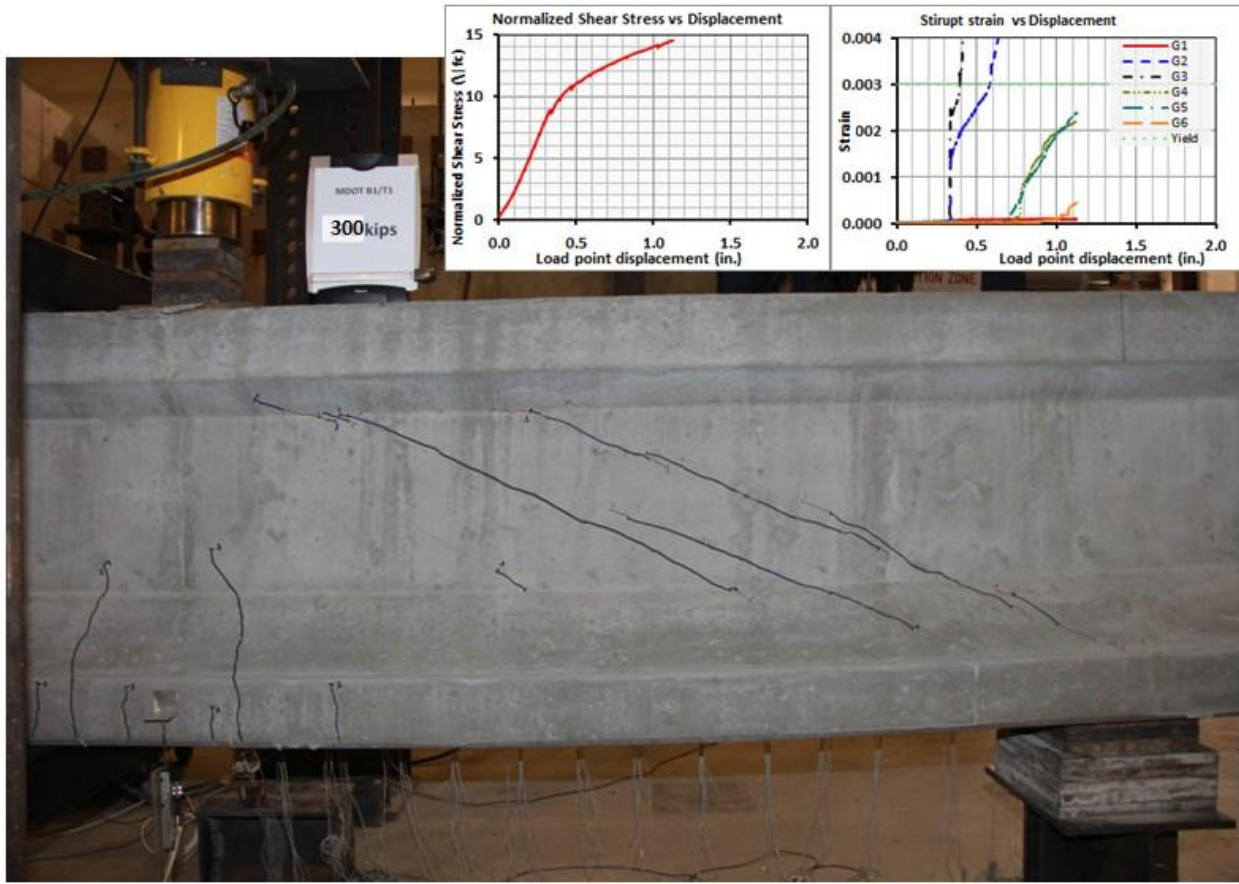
Beam 1 Test 1 Peak Load Before Failure.
